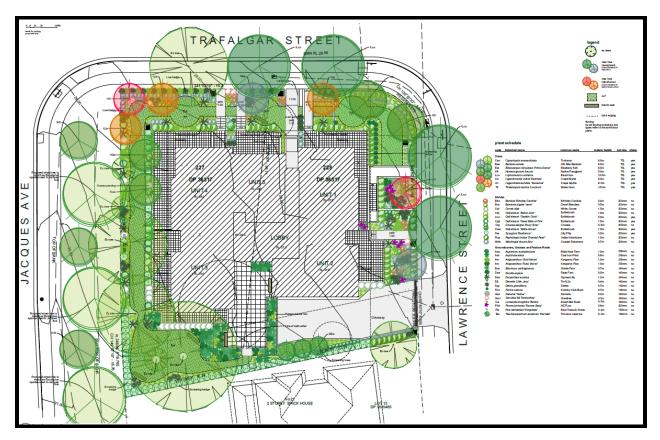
Reduced Landscape Plan (courtesy InView Design).
